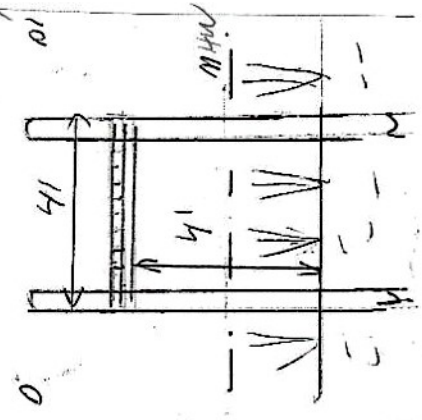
Plan view and cross-section sketches of proposed project. Sketches for permit application purposes only.
